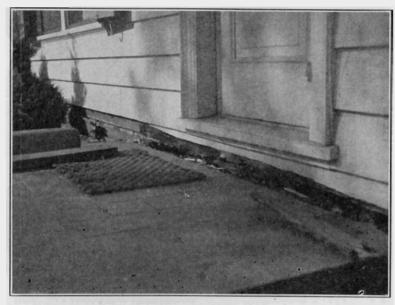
Termite damage to sill and sheathing adjoining masonry porch.
